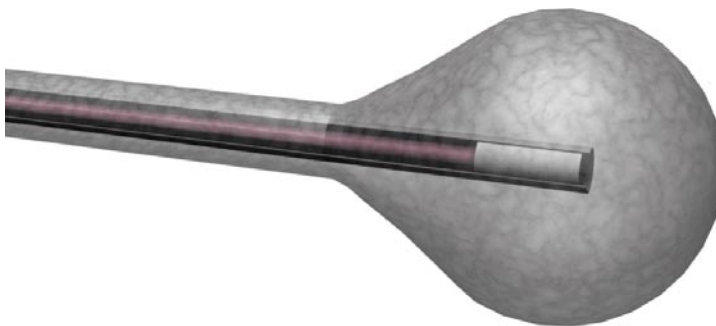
Fracture envelope for a blast hole. The gray flask shaped surface contains in principle all radial and conical blasting fractures directed back into the remaining rock. The fractures that brakes the burden are obviously longer.
